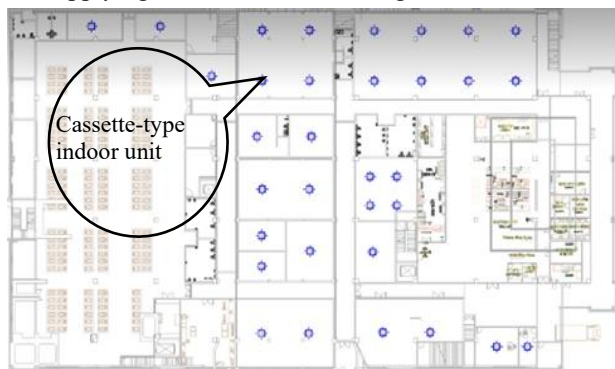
Floor plan after automatic cassette-type indoor unit layout based on the cost-saving option
